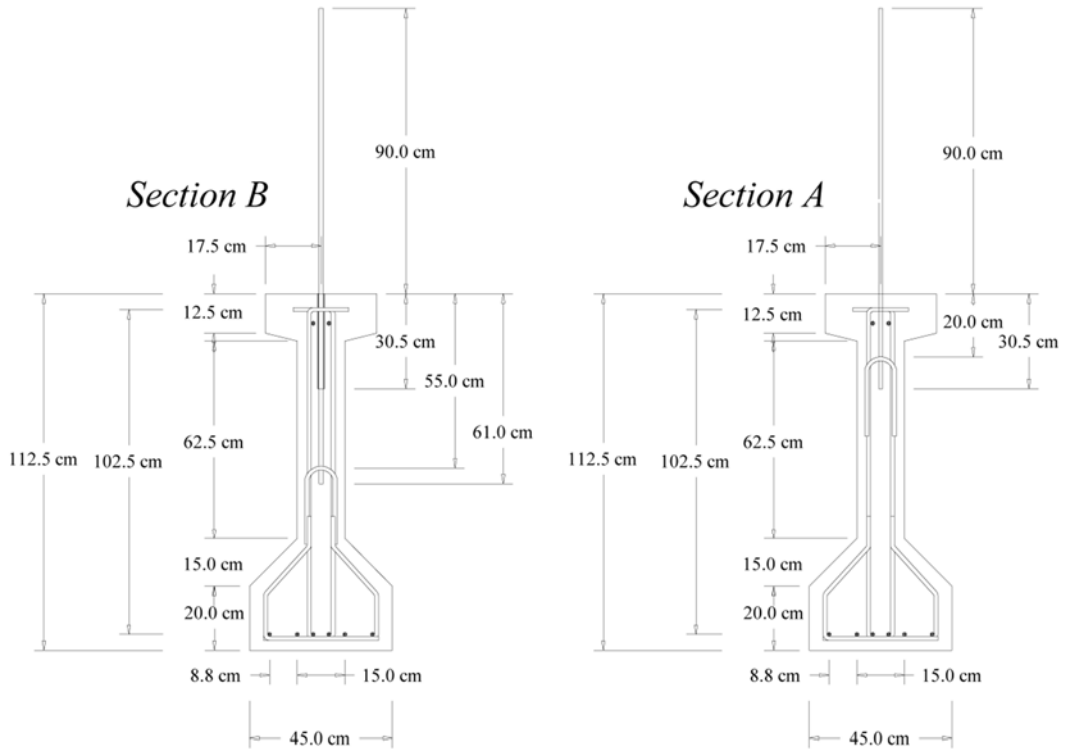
Cross-sectional drawing of the reinforcement of the I-beams.
